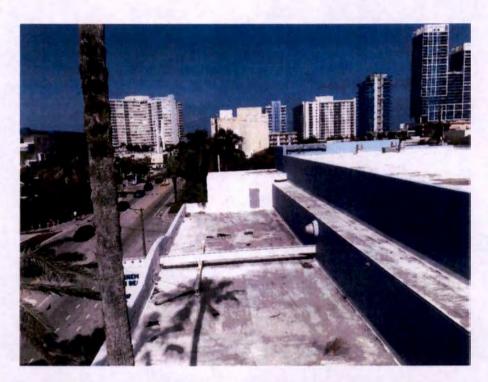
Low Roof at Second Level in North Portion of Building
